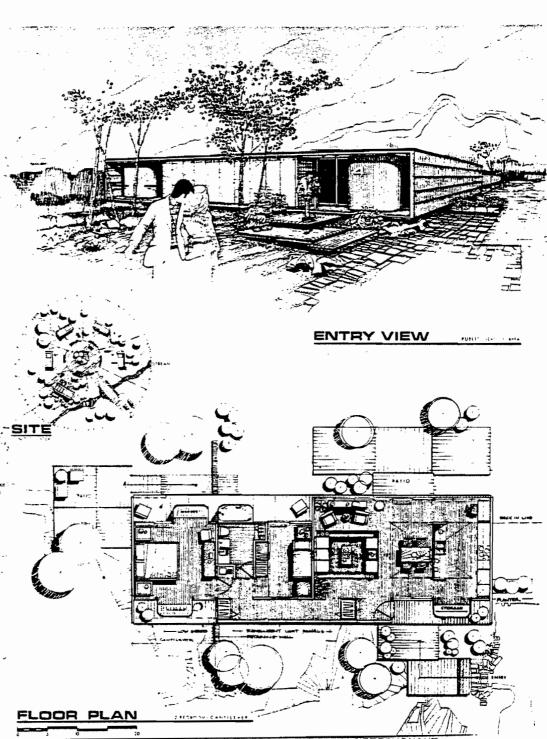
UNIT DESIGN: SITE PLANNING AS A DETERMINANT
